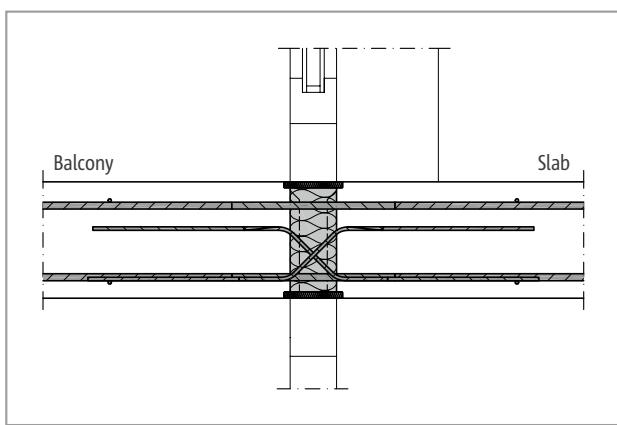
Schöck Isokorb® T type D: Installation section; one-way spanning
